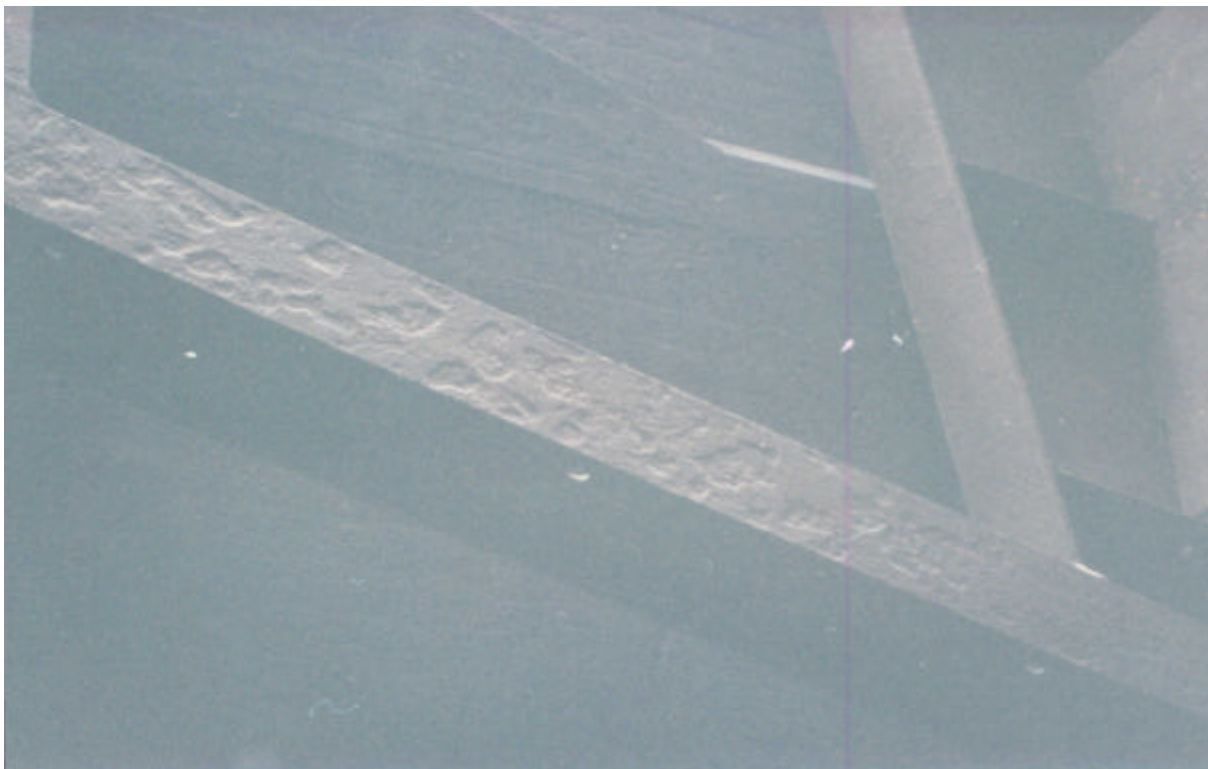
D. Markland Culvert Valve Strut Arm
